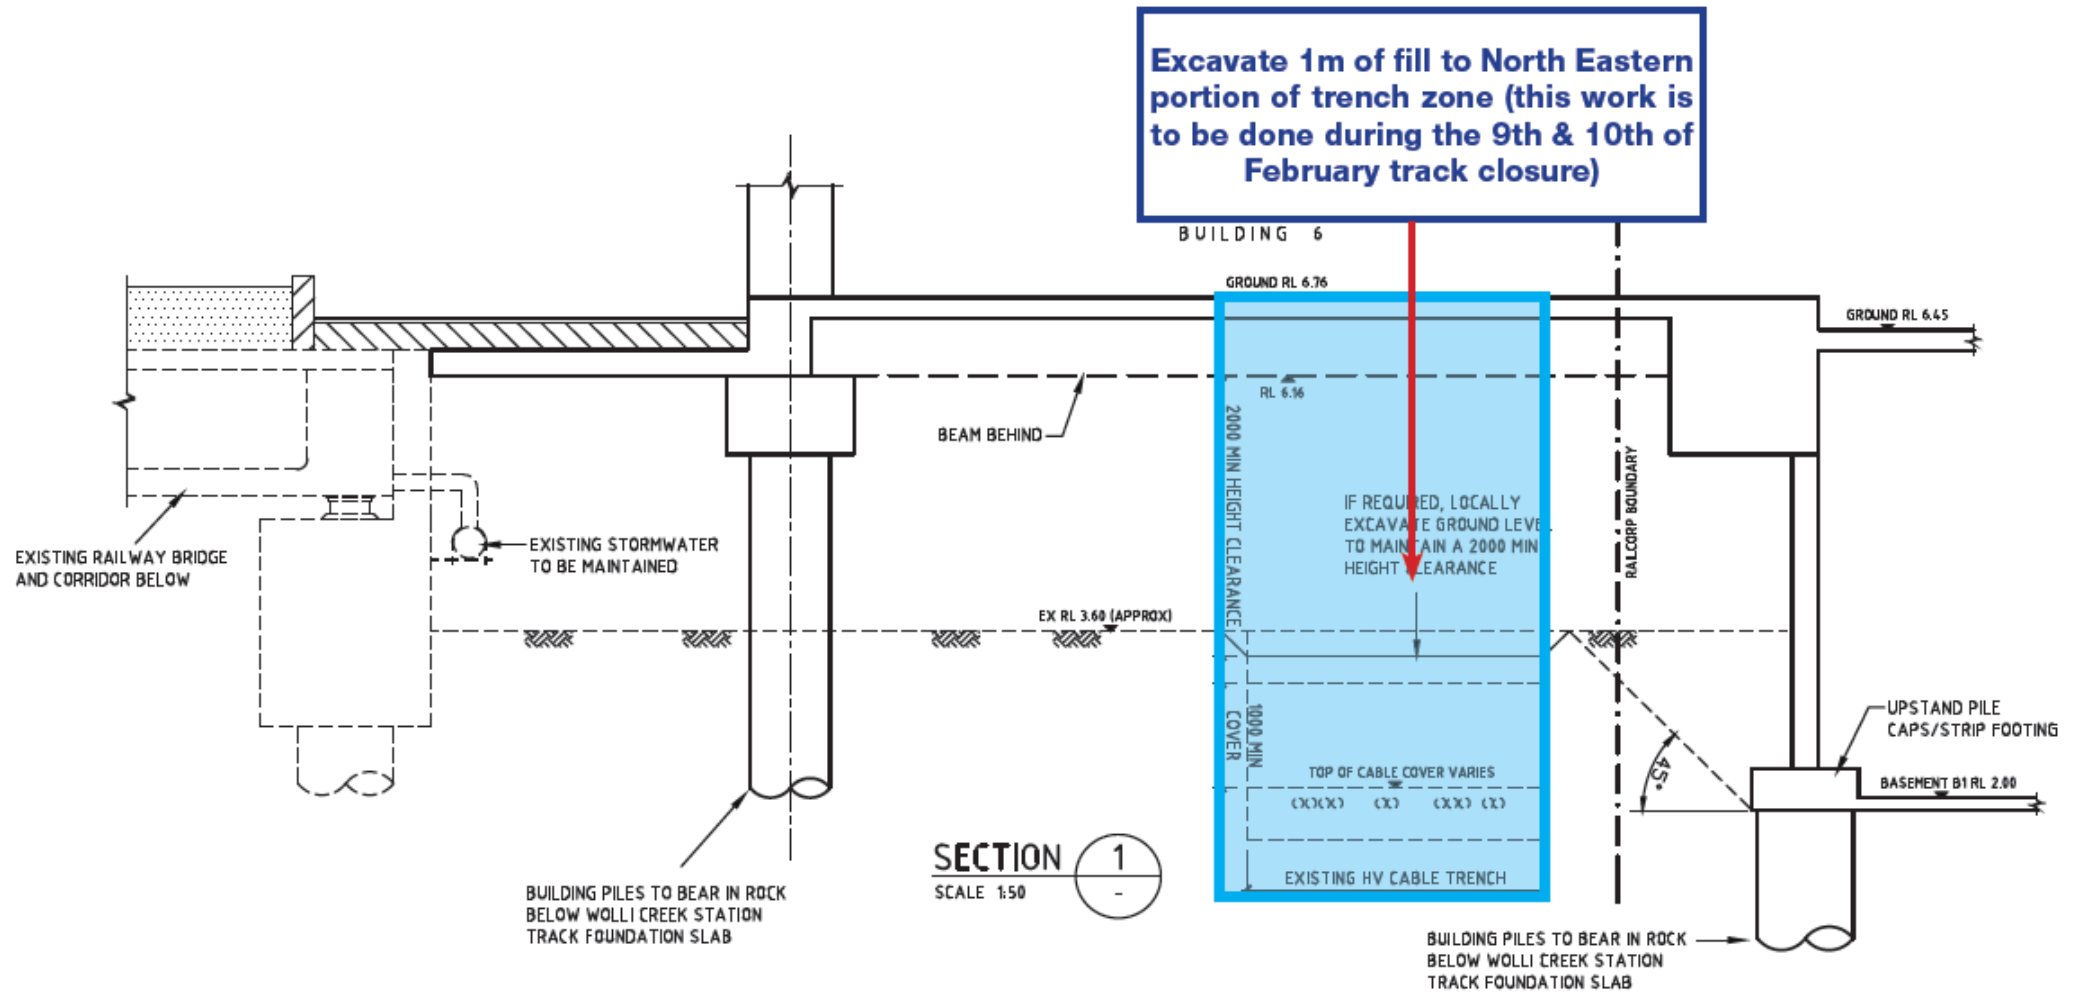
Section 2 Diagrammatic Explanation – Excavation Works (Detailed Section)
